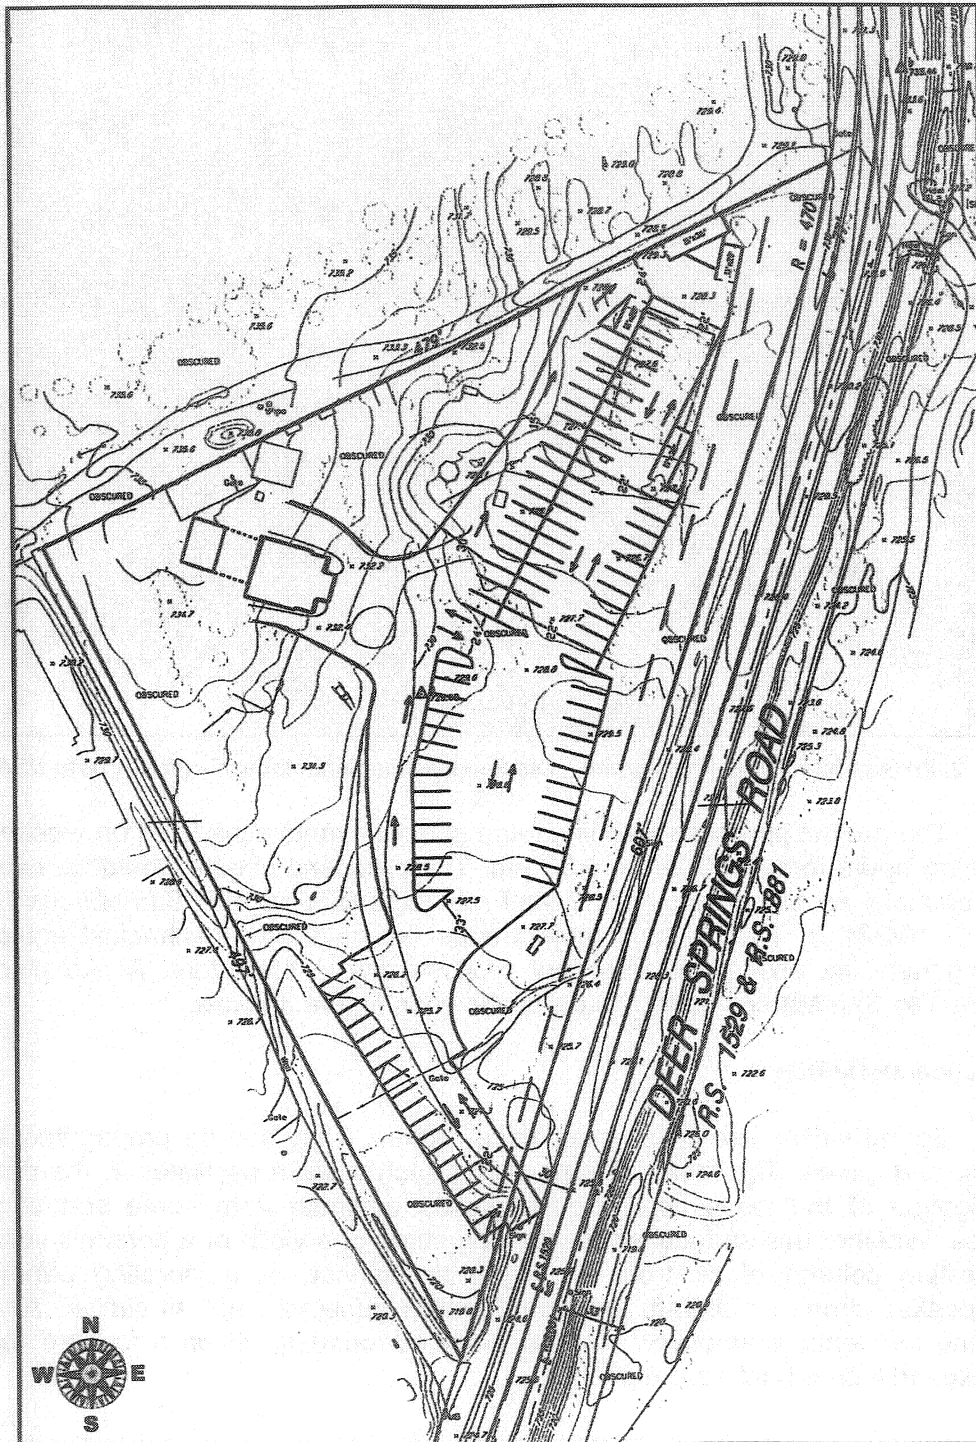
Proposed Site Plan – Old School House Site Plan (Graves Engineering, 2005)
